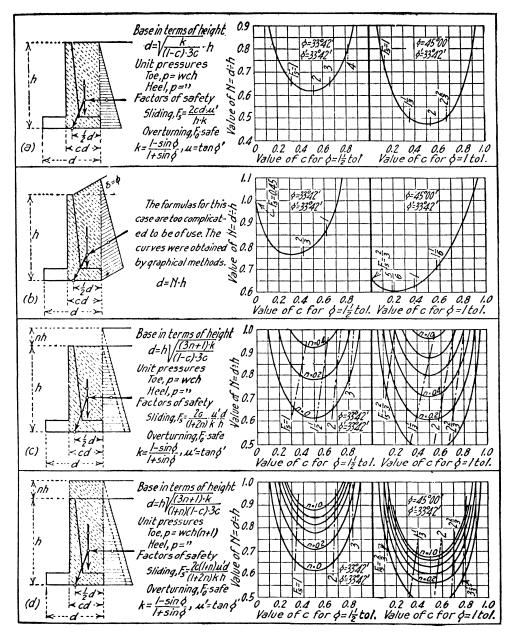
APPROXIMATE DESIGN OF REINFORCED CONCRETE RETAINING WALLS. (Resultant thrust at center of base.)
